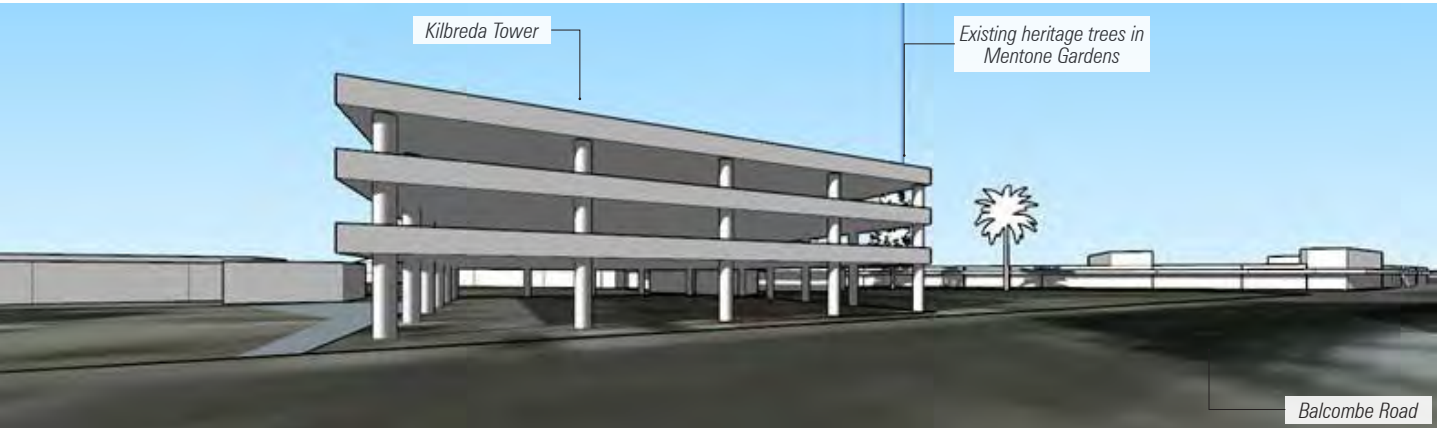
Indicative model of LXRA proposed multi-deck car park: view west across the intersection of Balcombe Road and Swanston Street
